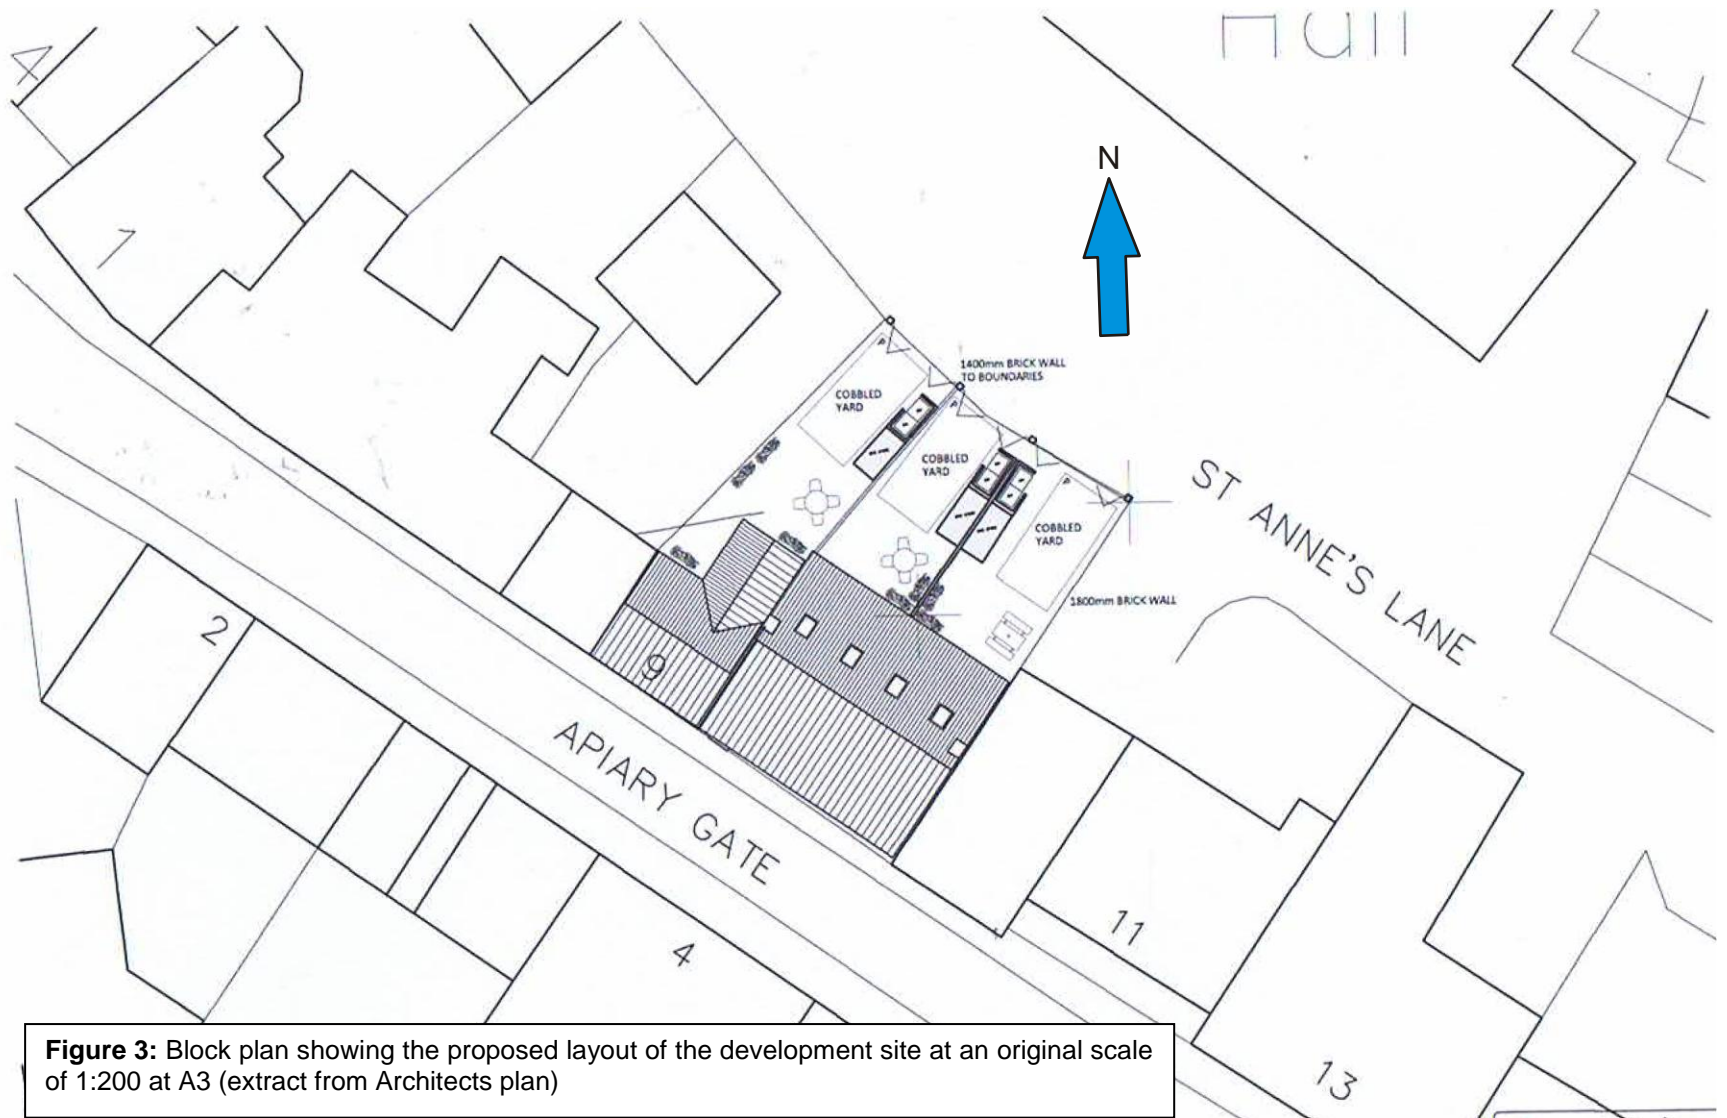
Block plan showing the proposed layout of the development site at an original scale of 1:200 at A3 (extract from Architects plan)
